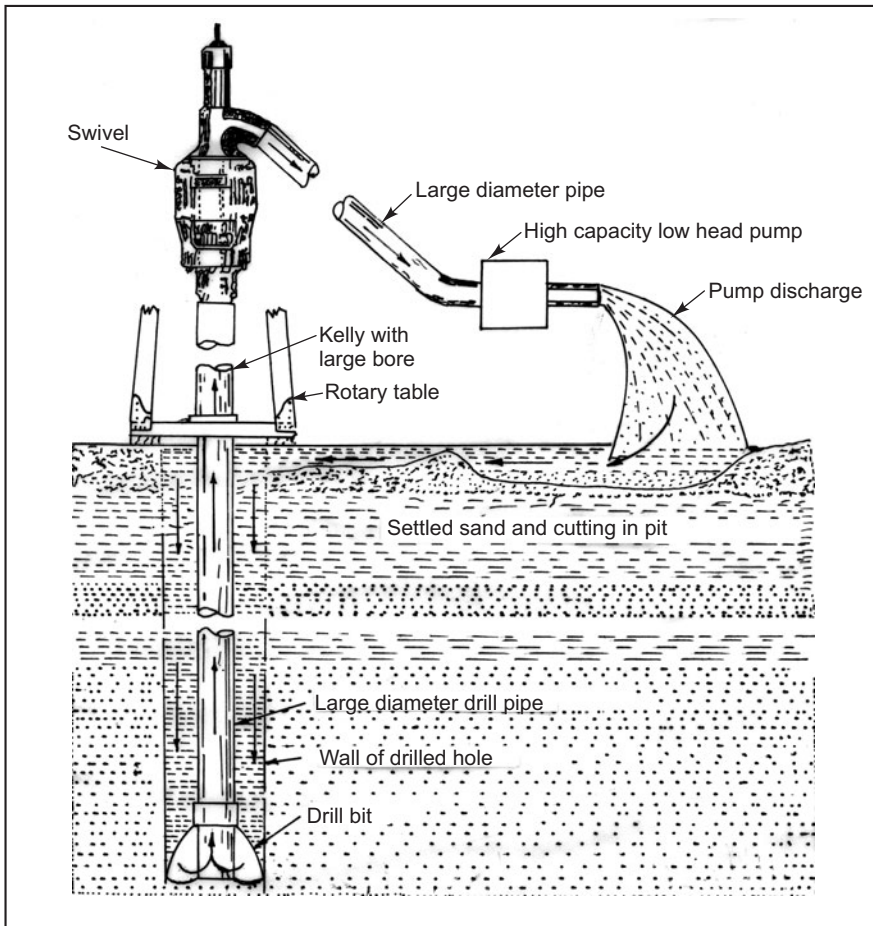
Schematic sketch illustrating basic principles of reverse rotary drilling
